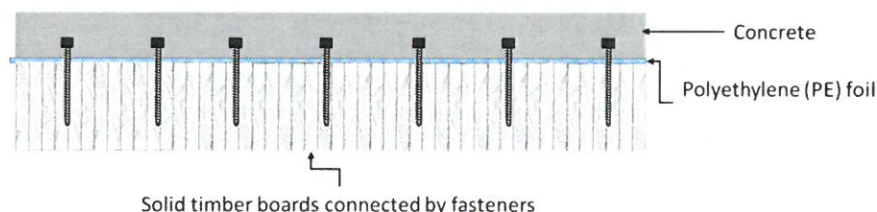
Wood-concrete composite slab with dowel-type fasteners – EAD n° 130090-00-0303
